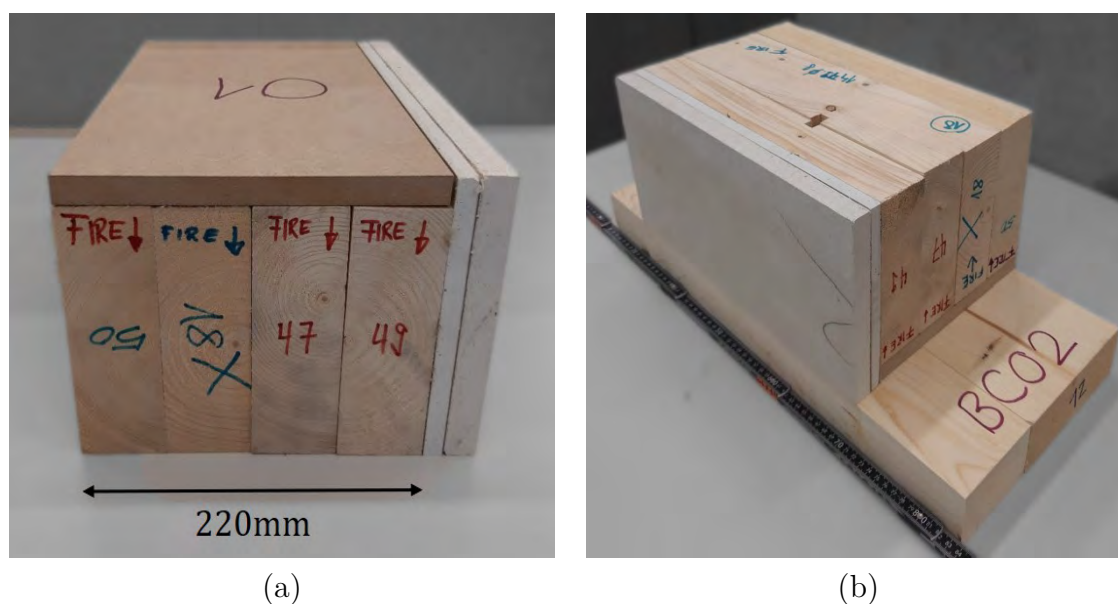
Specimen BC1 (a) and BC2 (b) under assembly. Images by F. Hirzel.
